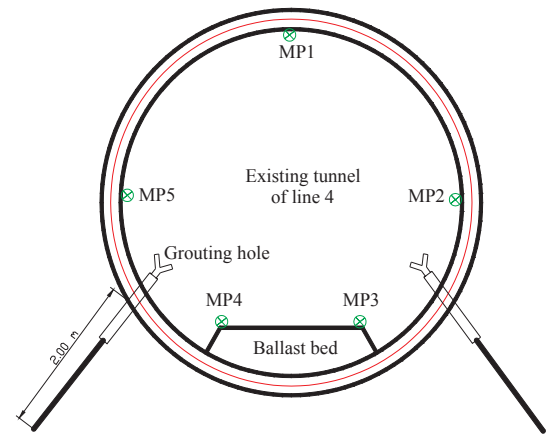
The position of the grouting holes in the existing tunnel and the layout of the deformation measuring points.
